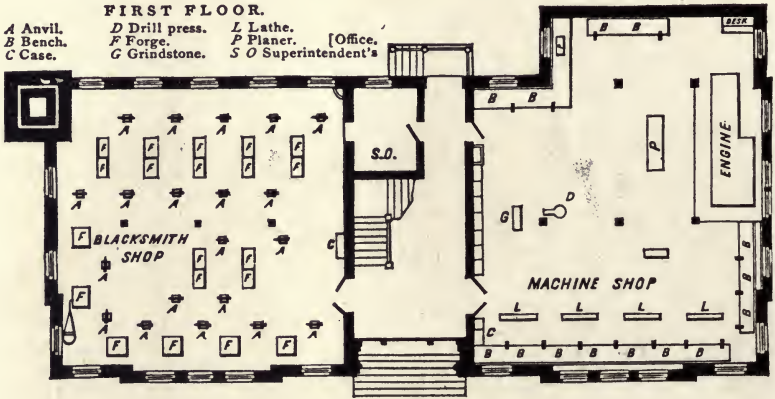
FIRST-FLOOR PLAN, ST. LOUIS MANUAL TRAINING SCHOOL
